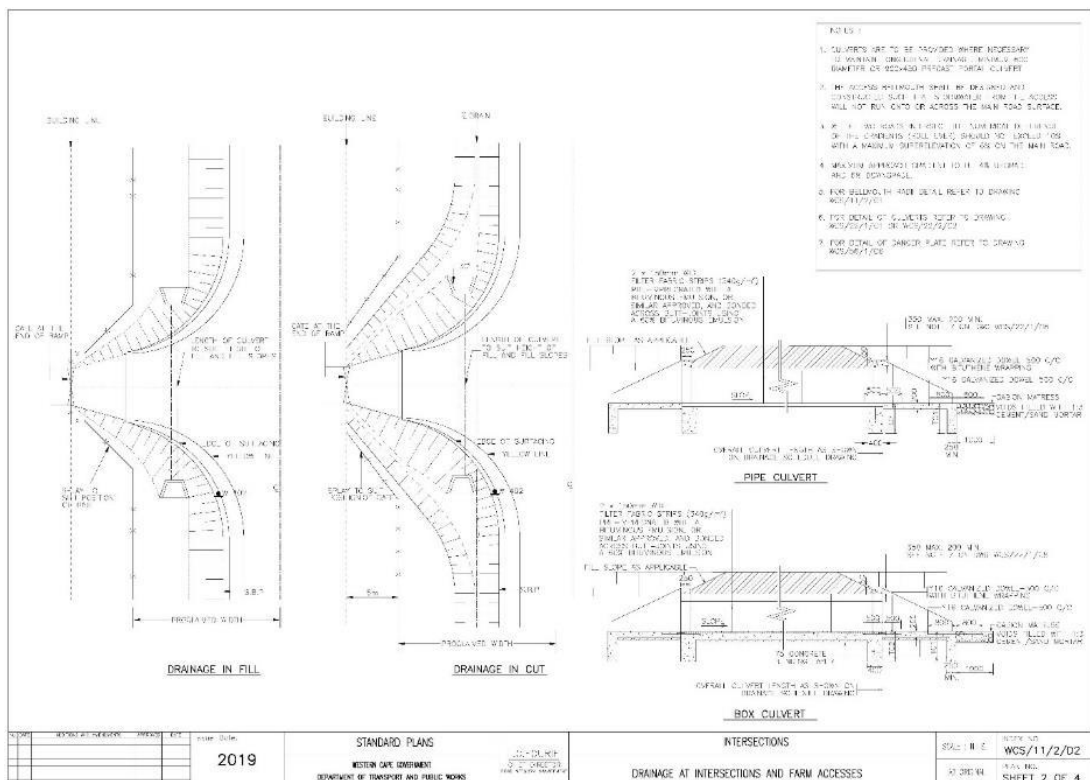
Typical Drainage at Intersections and Farm Accesses
